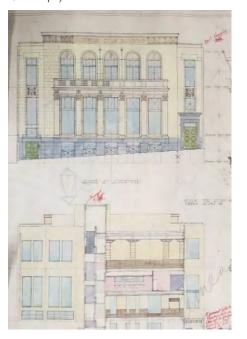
Extract from 1927 building plans showing elevation and section of 131-141 Queen Street. (Source: PROV VPRS 11200/P1, unit 1175, item 9615)
